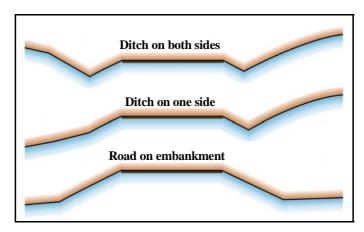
Typical cross sections used in the analysis presented in figure 67.
